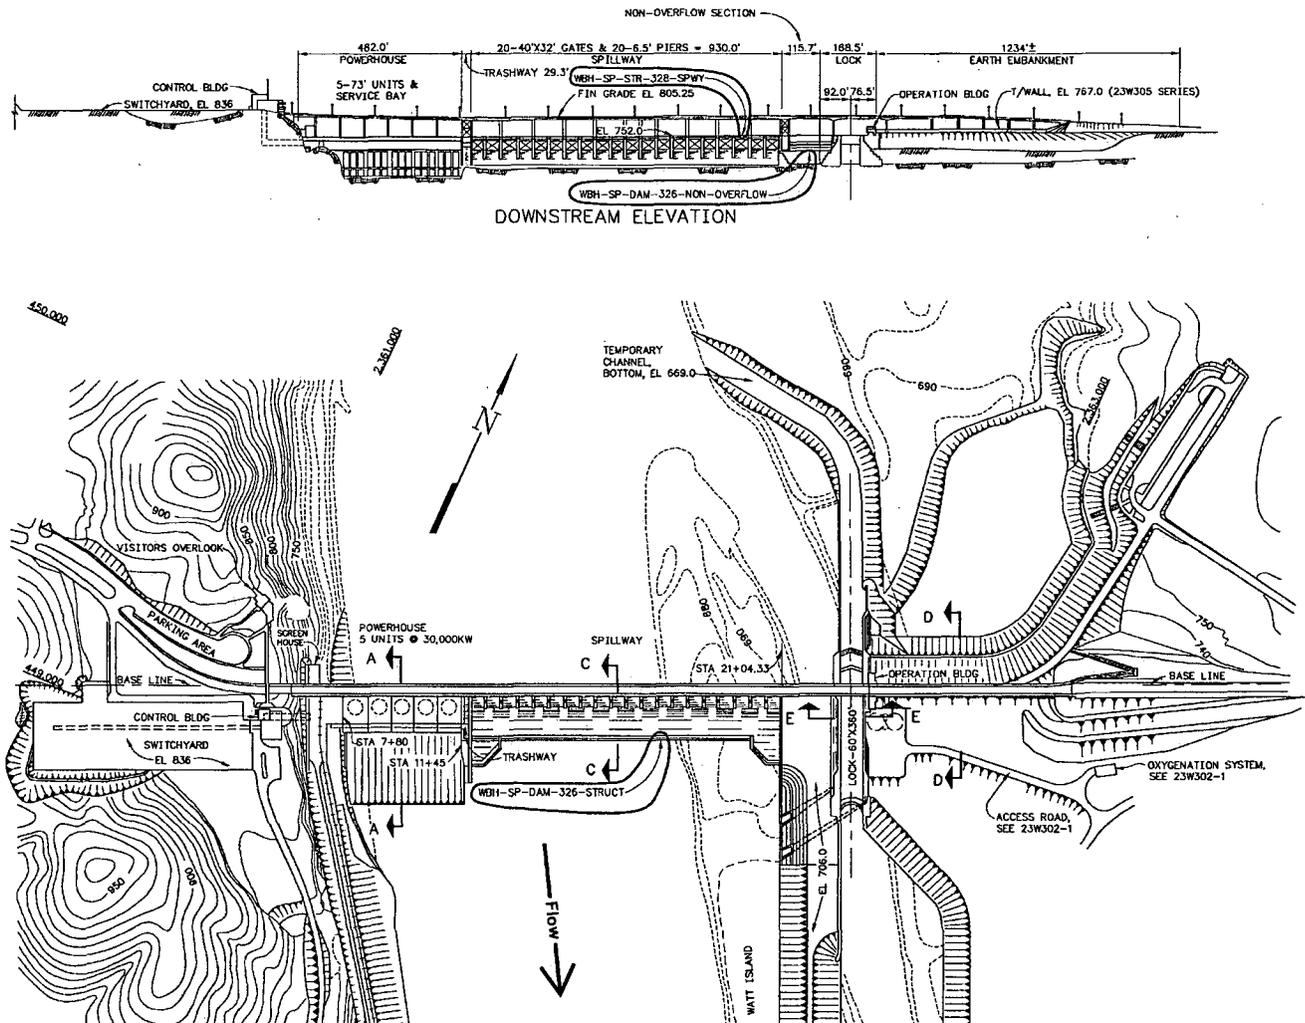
Watts Bar Dam, General Plan and Elevation (Ref. 1; also refer to Attachments 15-4 to 15-8 for 1997 modifications to east embankment, as constructed, and Attachment 52 for 2009 modifications to east embankment, as proposed.).
